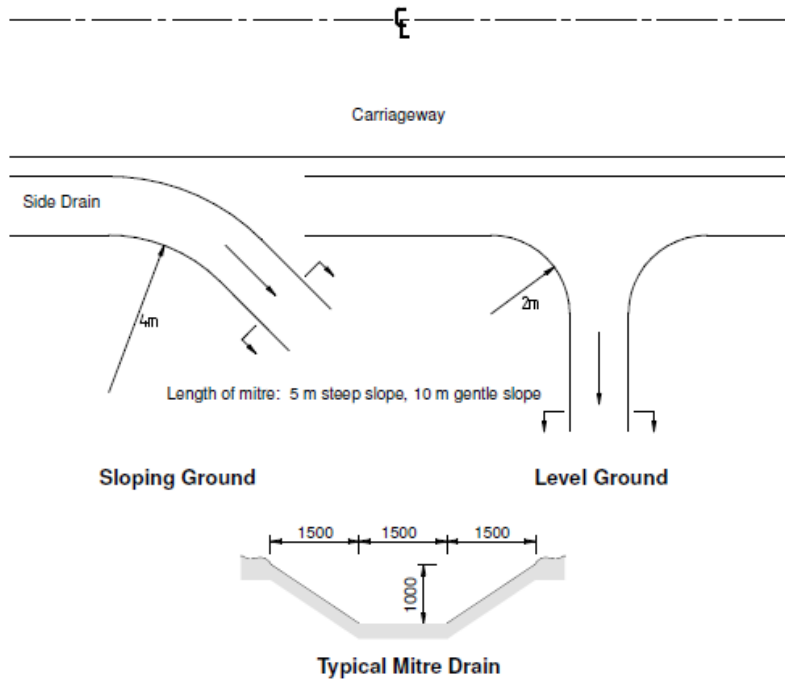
2 Typical Stormwater Mitre Drain / Channel
